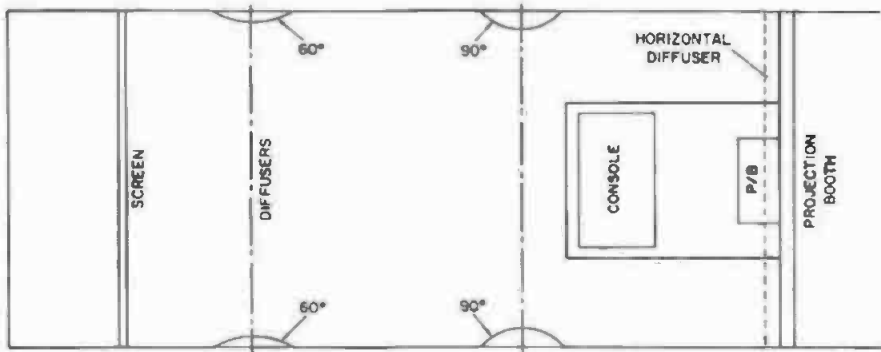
E. Floor plan of dubbing stage showing the positions of the poly-cylindrical diffusers.
